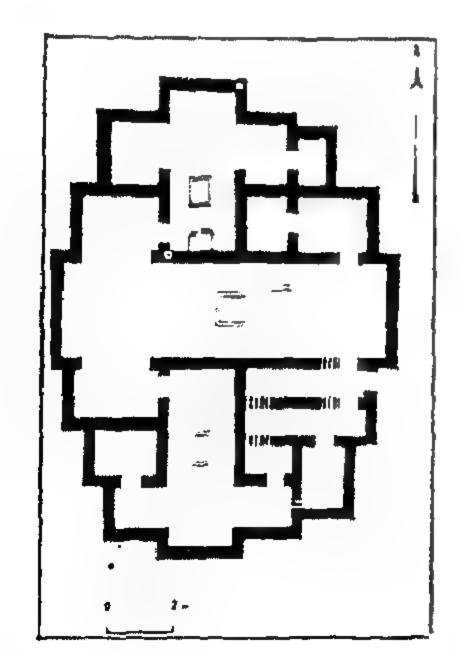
Plan of the building 1 at Kheit Qasim (after Forest-Foucault, in Press).
